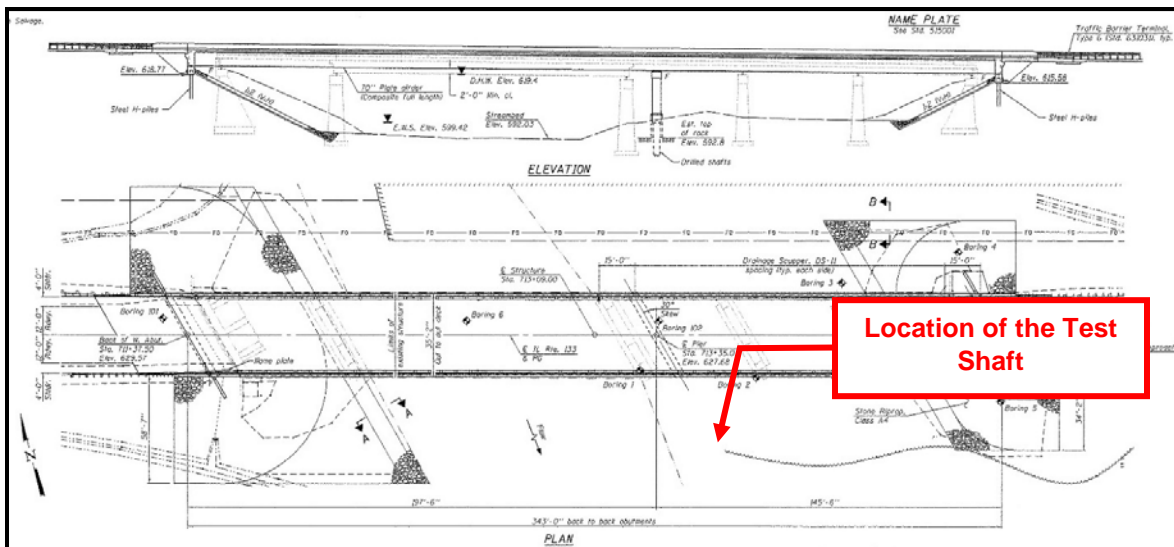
Location of test shaft of the bridge site at IL 133 over the Embarras River.
